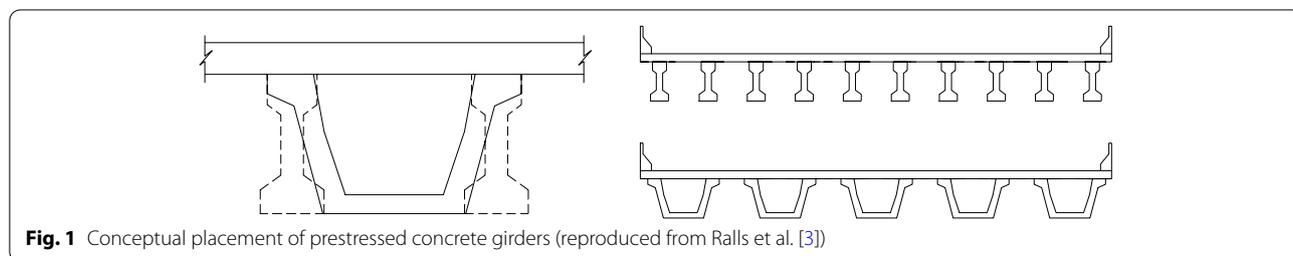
Conceptual placement of prestressed concrete girders (reproduced from Ralls et al. [3])
